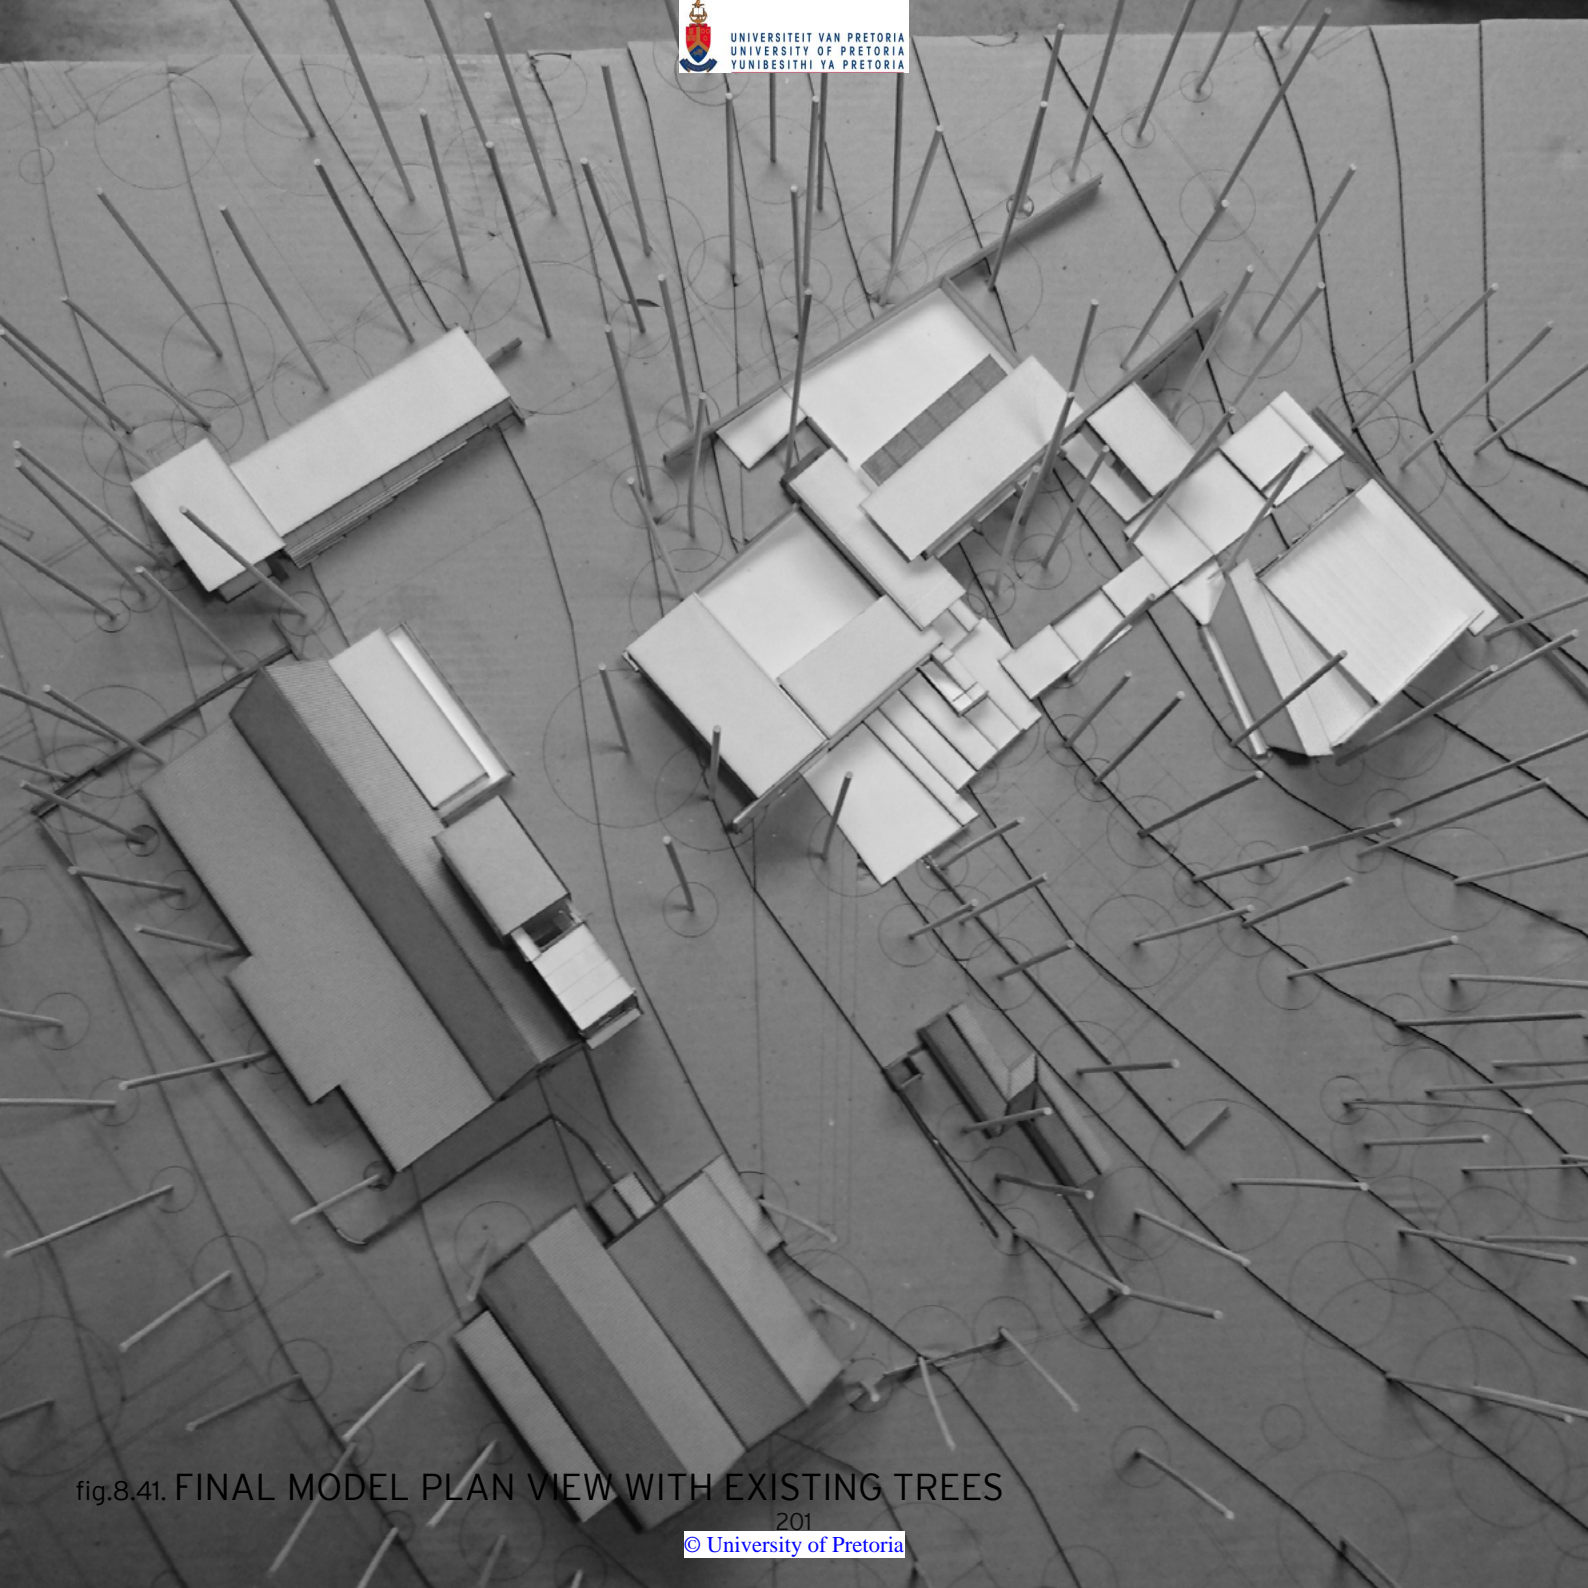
FINAL MODEL PLAN VIEW WITH EXISTING TREES
